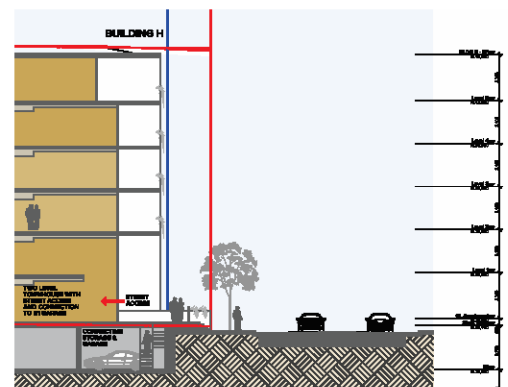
6.2.4 Revision A doesn't indicate a level transition between the two-storey townhouse dwelling form and the street. It is understood this is a drafting error and should be addressed in the refinement of the drawings.
